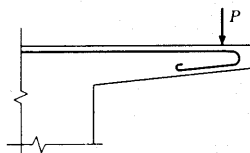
Development of primary reinforcement of cantilever slab subject to greater load at the edge
